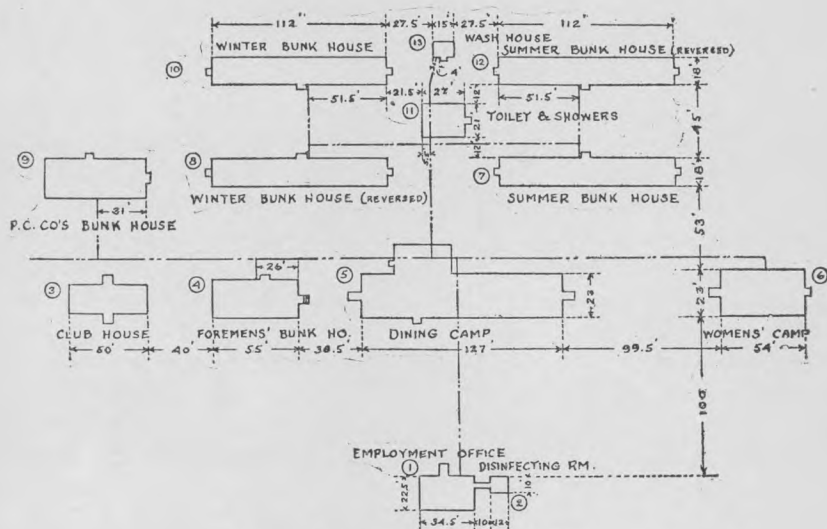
LAYOUT OF CAMP BUILDINGS.
